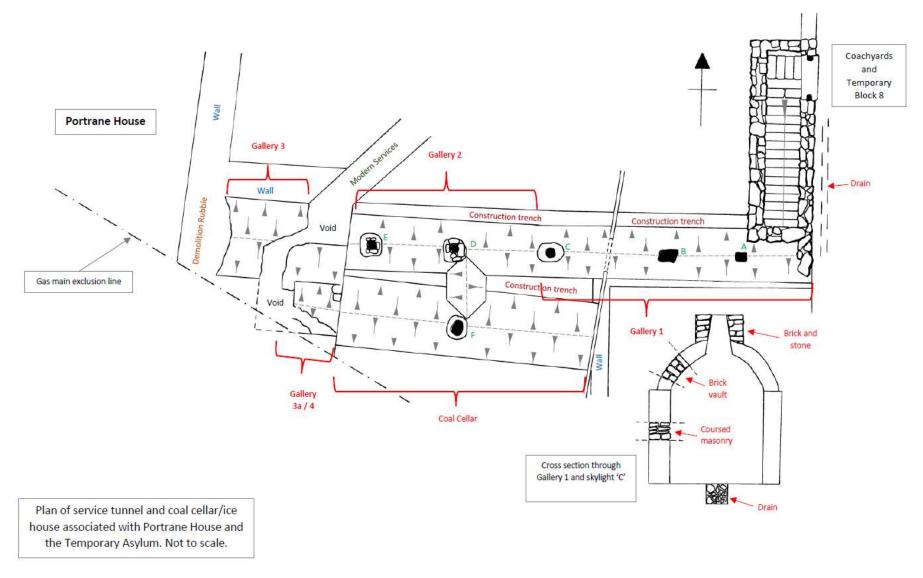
Area 3. Service tunnels to the east of Portrane House as excavated (2016)
